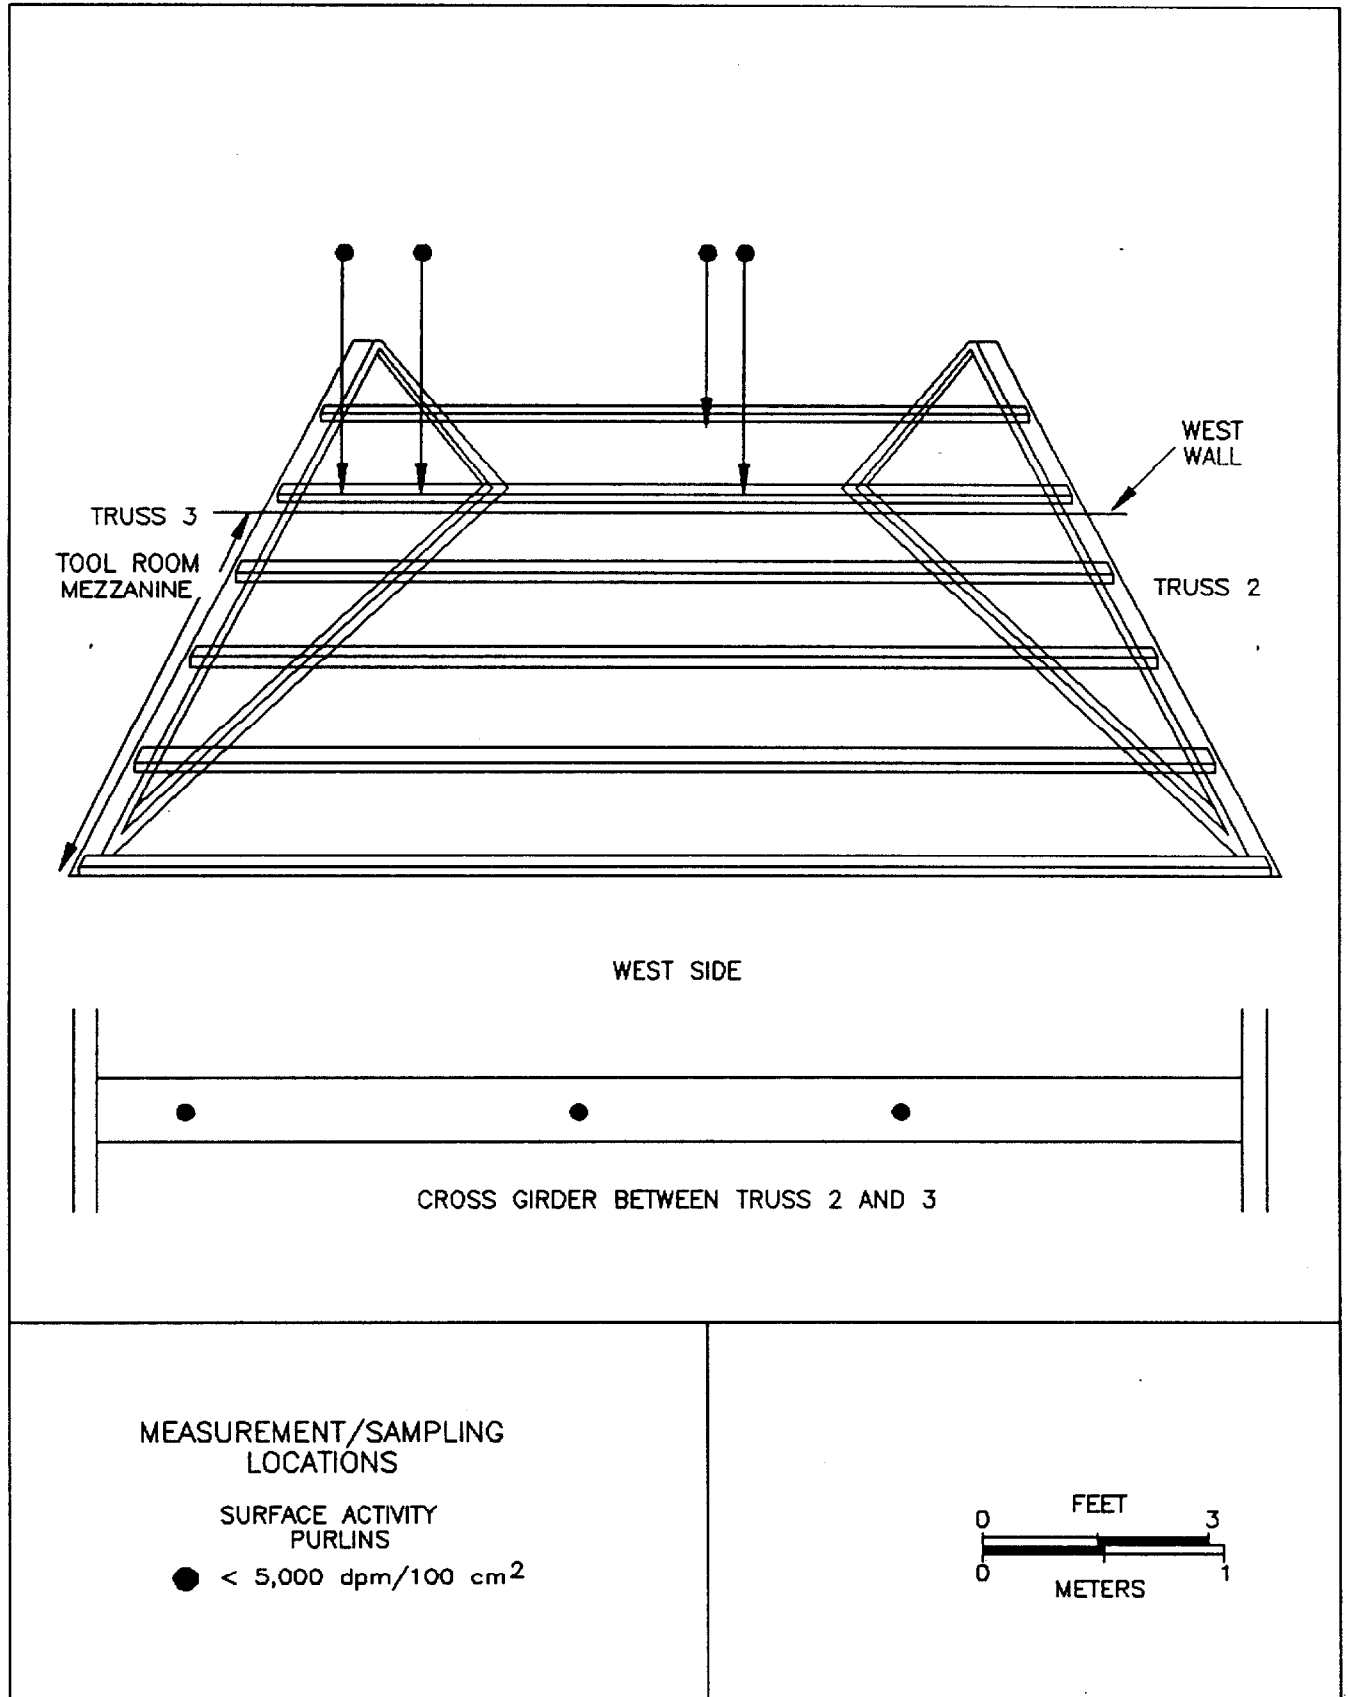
Building 8, Bay 2, West – Measurement and Sampling Locations
